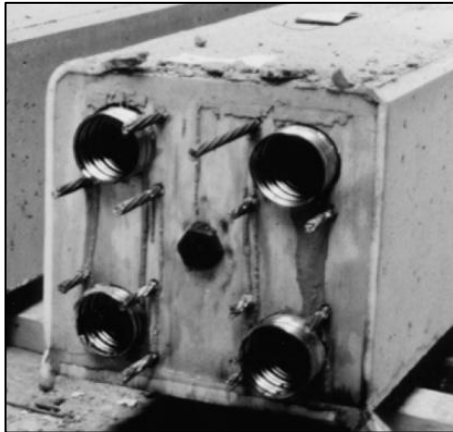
Graphical illustration of the welded bearing plate connection (Paradigm 2008)
